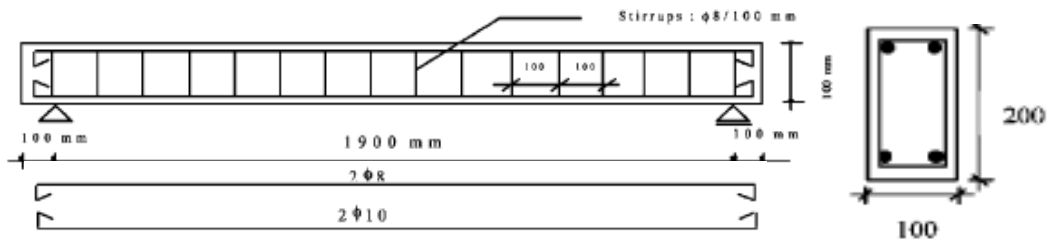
18- Reinforcement Details of Beam BB (Ozturk et al. 2002).
